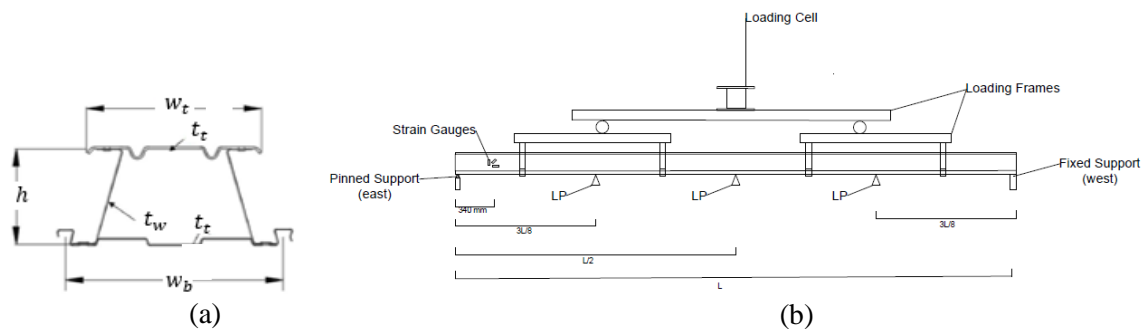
TSD Specimen Profile; (a) Cross section, (b) Test setup
